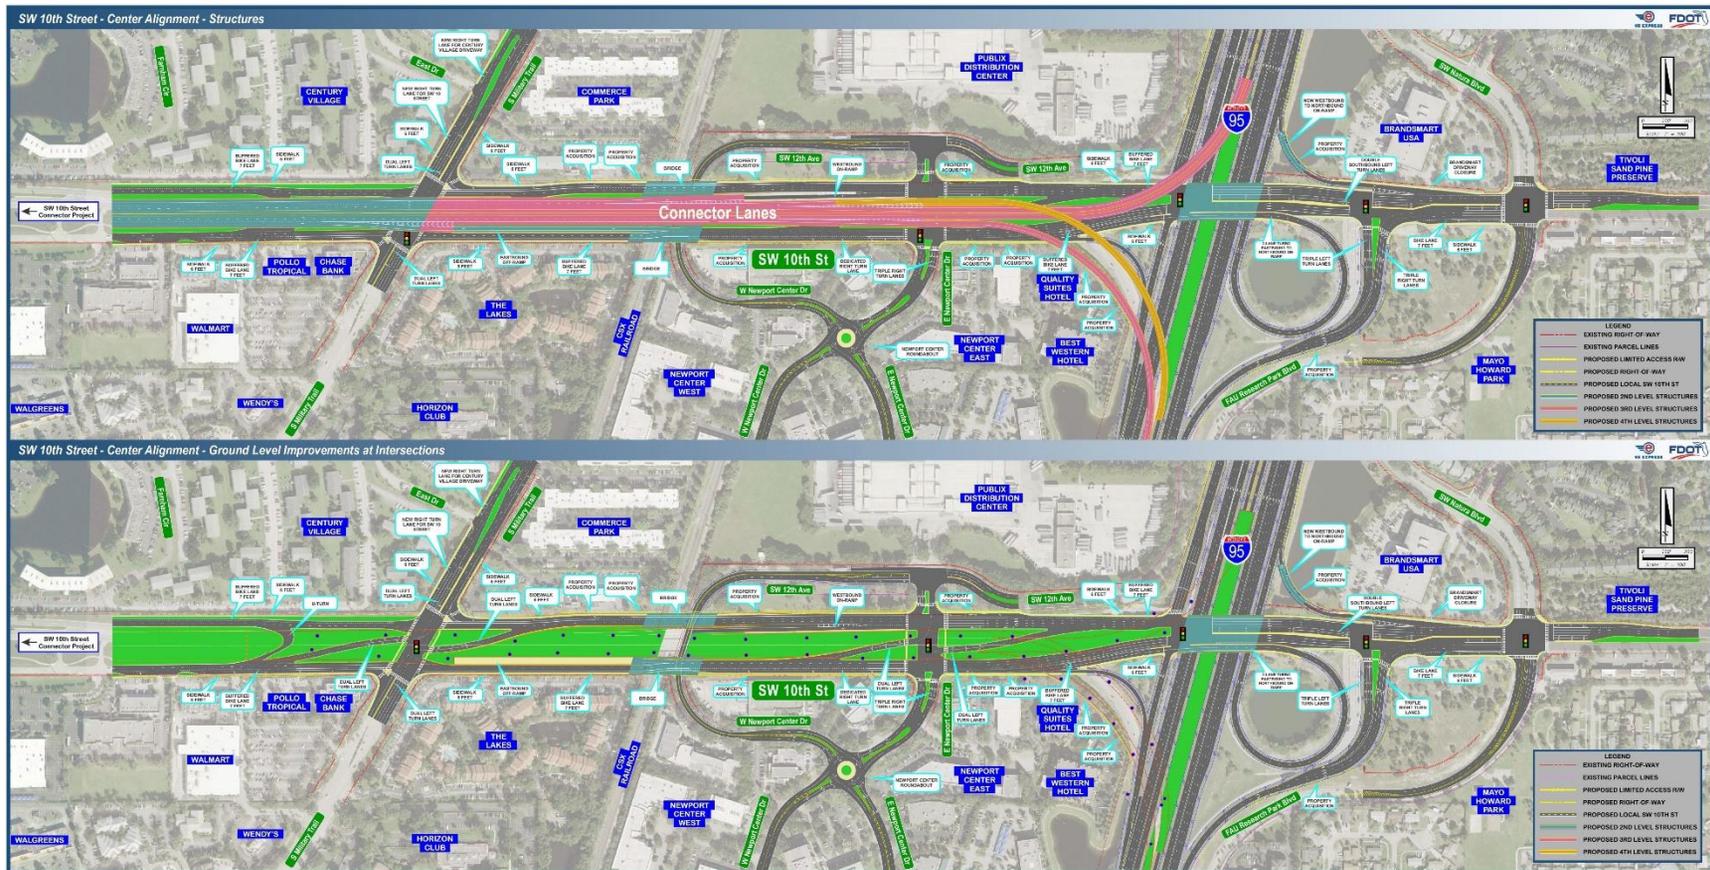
SW 10 Street – Center Alignment Concept Plan
